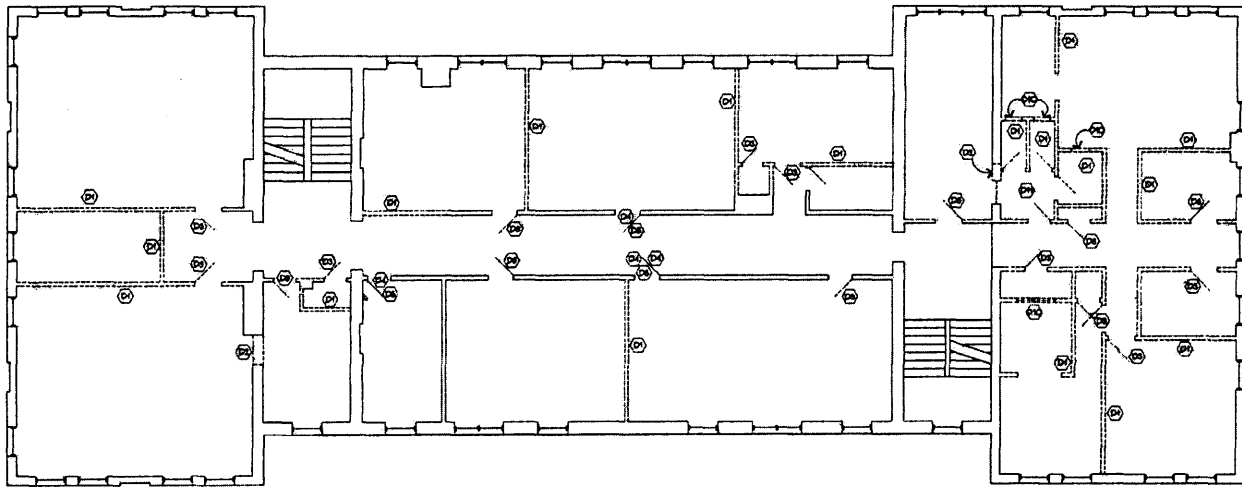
Second floor plan, by Johnson Laffen Galloway Architects, September 2004.
